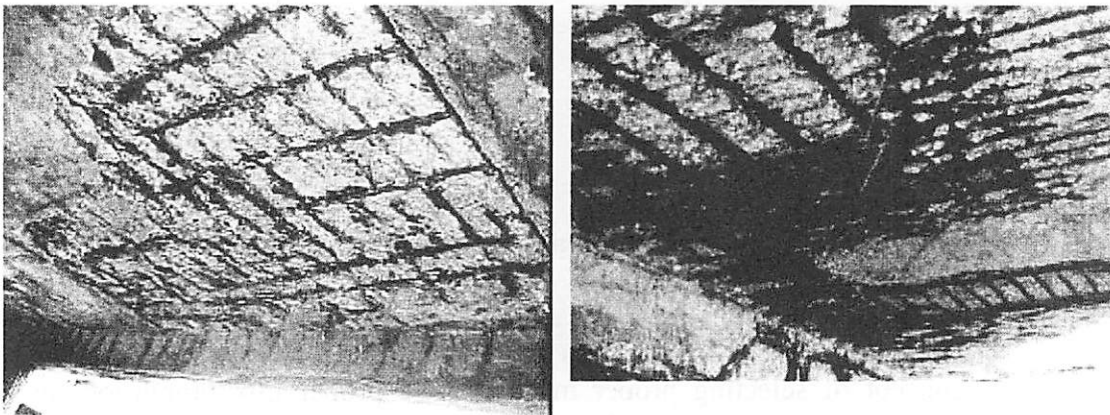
Crack on a roof slab of a stadium (Analysis and design problem)
